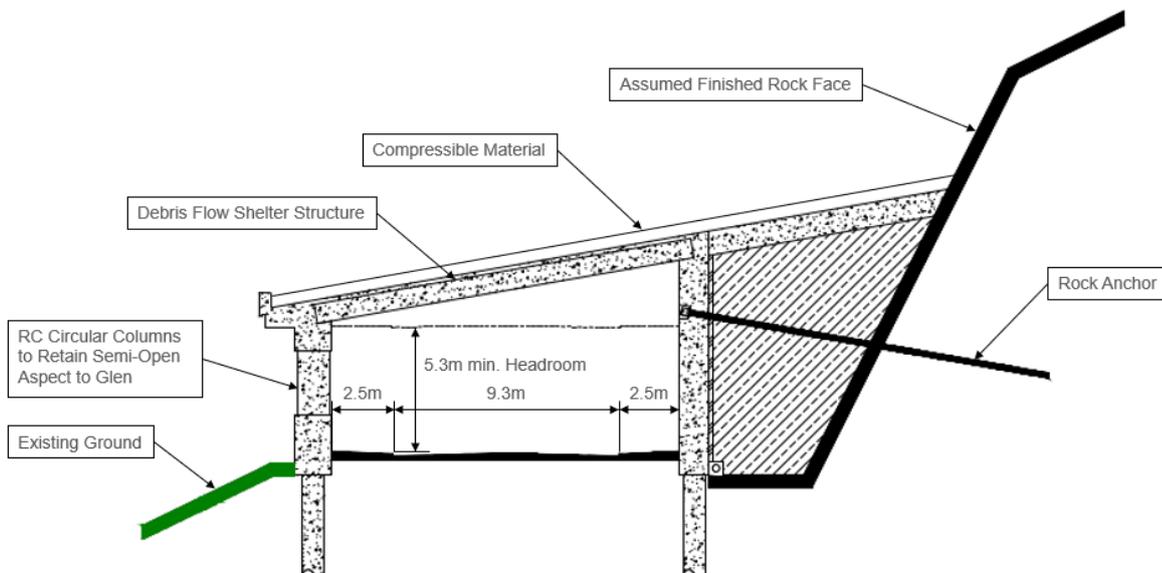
Conceptual sketch of Debris Flow Shelter with concrete roof slab sloped towards valley floor
